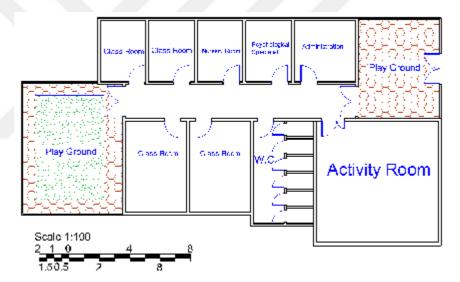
Floor plan of Misrata B Kindergarten (Drawn by author)
